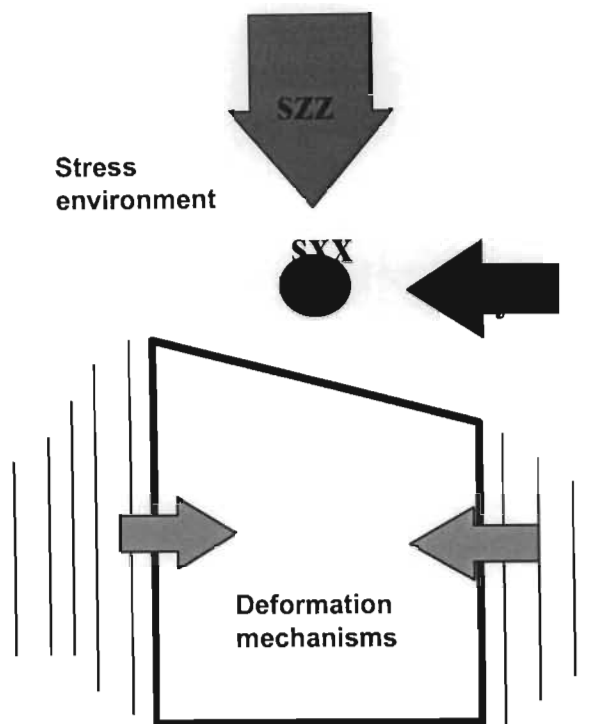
Tunnel sidewall deformation as a function of a high vertical stress component.
